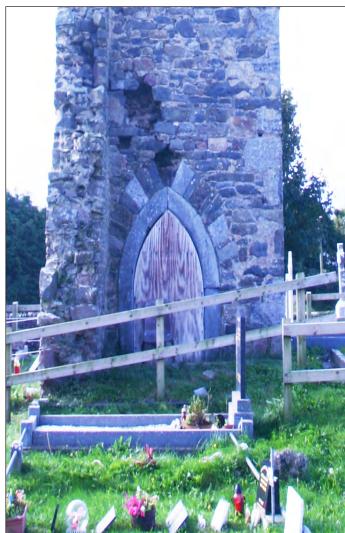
View of boarded up entrance to tower on north elevation. Note missing keystone and other masonry voiding
